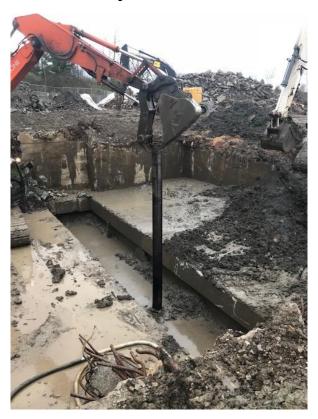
Demolition of side walls at Silo 4 (10/10/18).
